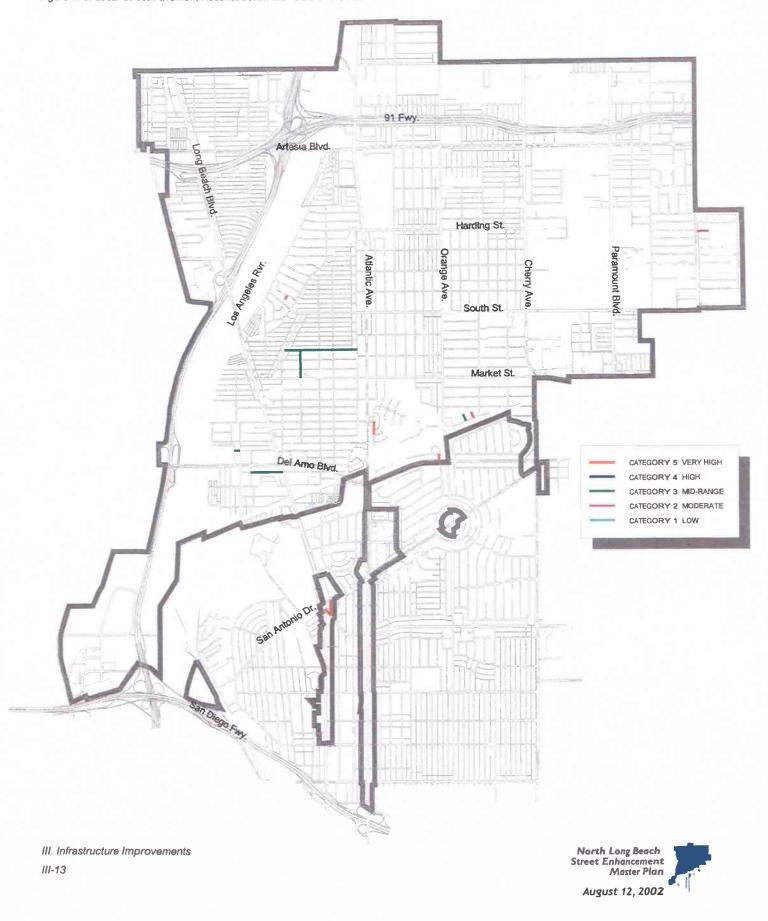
Sidewalk - Local Street Pavement Restructuring List
